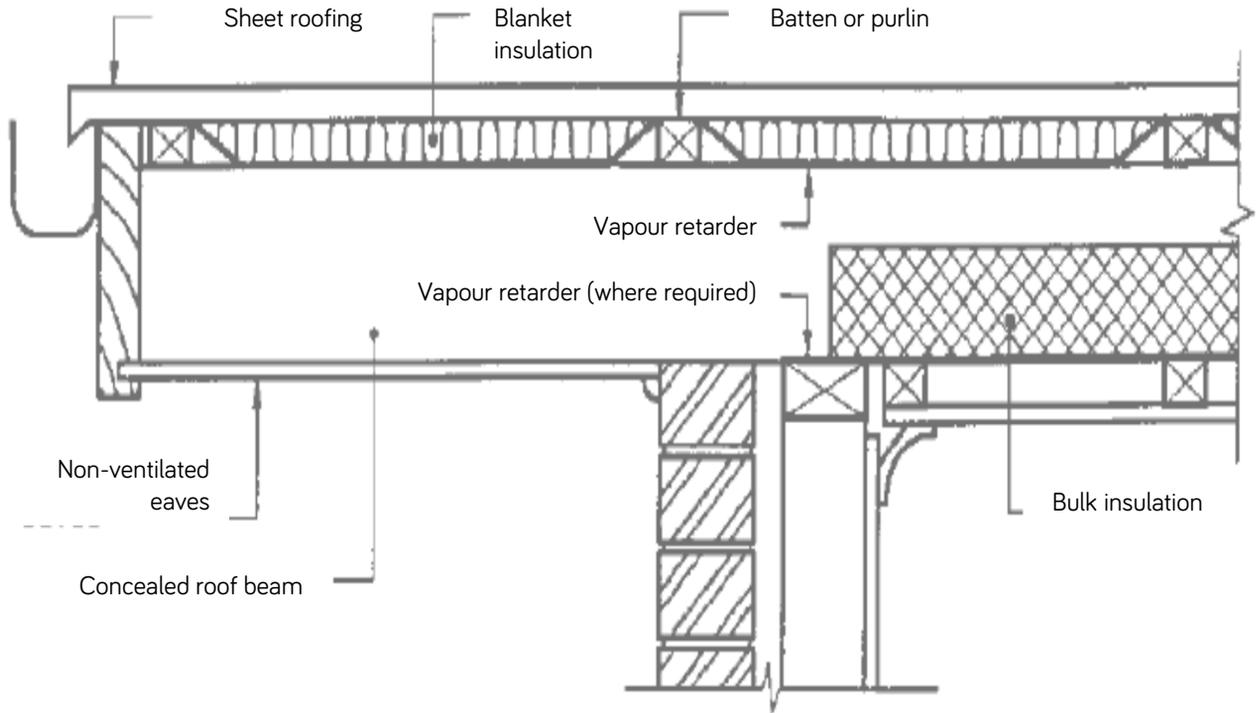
Blanket insulation in contact with sheet roofing and bulk insulation on ceiling & Insulation of horizontal ceilings with flat or low pitched metal roofs
